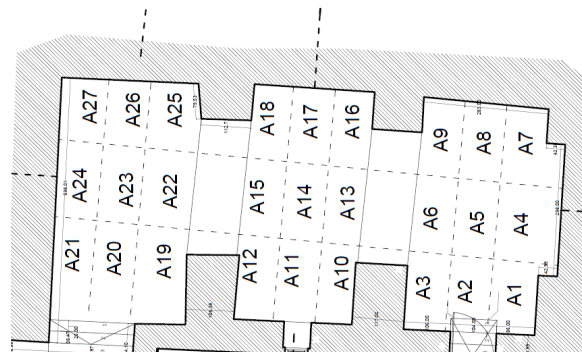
Sample room dividing plan 2 (TEMA 2008, Organized by Author)
